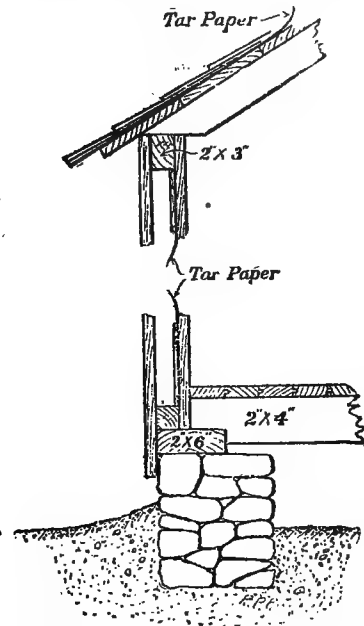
Method of Building Poultry House with Hollow Side Walls.
